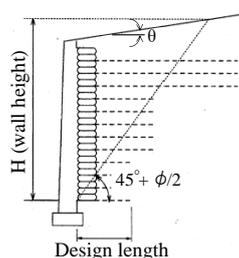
Arrangement when the backfill is back-sloped
